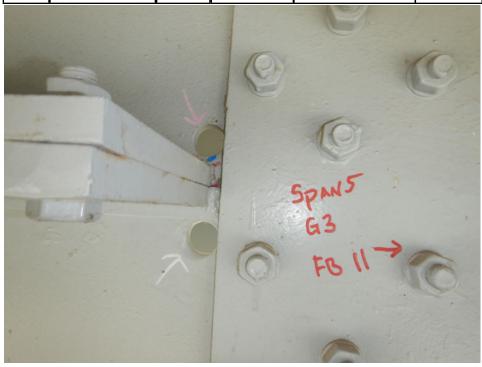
Looking north at girder 2, span 5 near floor beam 11. Note: no change to 2-inchlong crack retrofitted with crack arrested bushing in the upper web.
